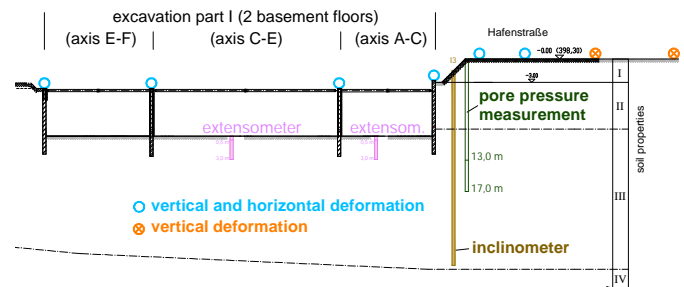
Instrumentation through MQ 3 at the test excavation pit
